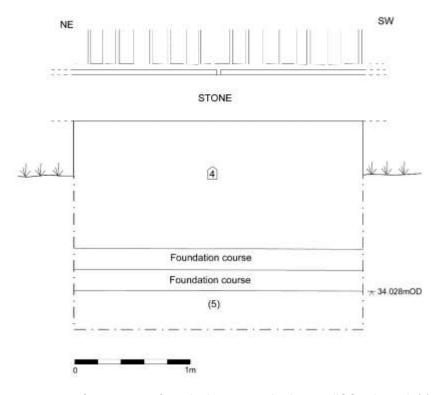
NW facing section of trench, showing metal railings, wall [4] and gravels (5). Original drawn at 1:10.
